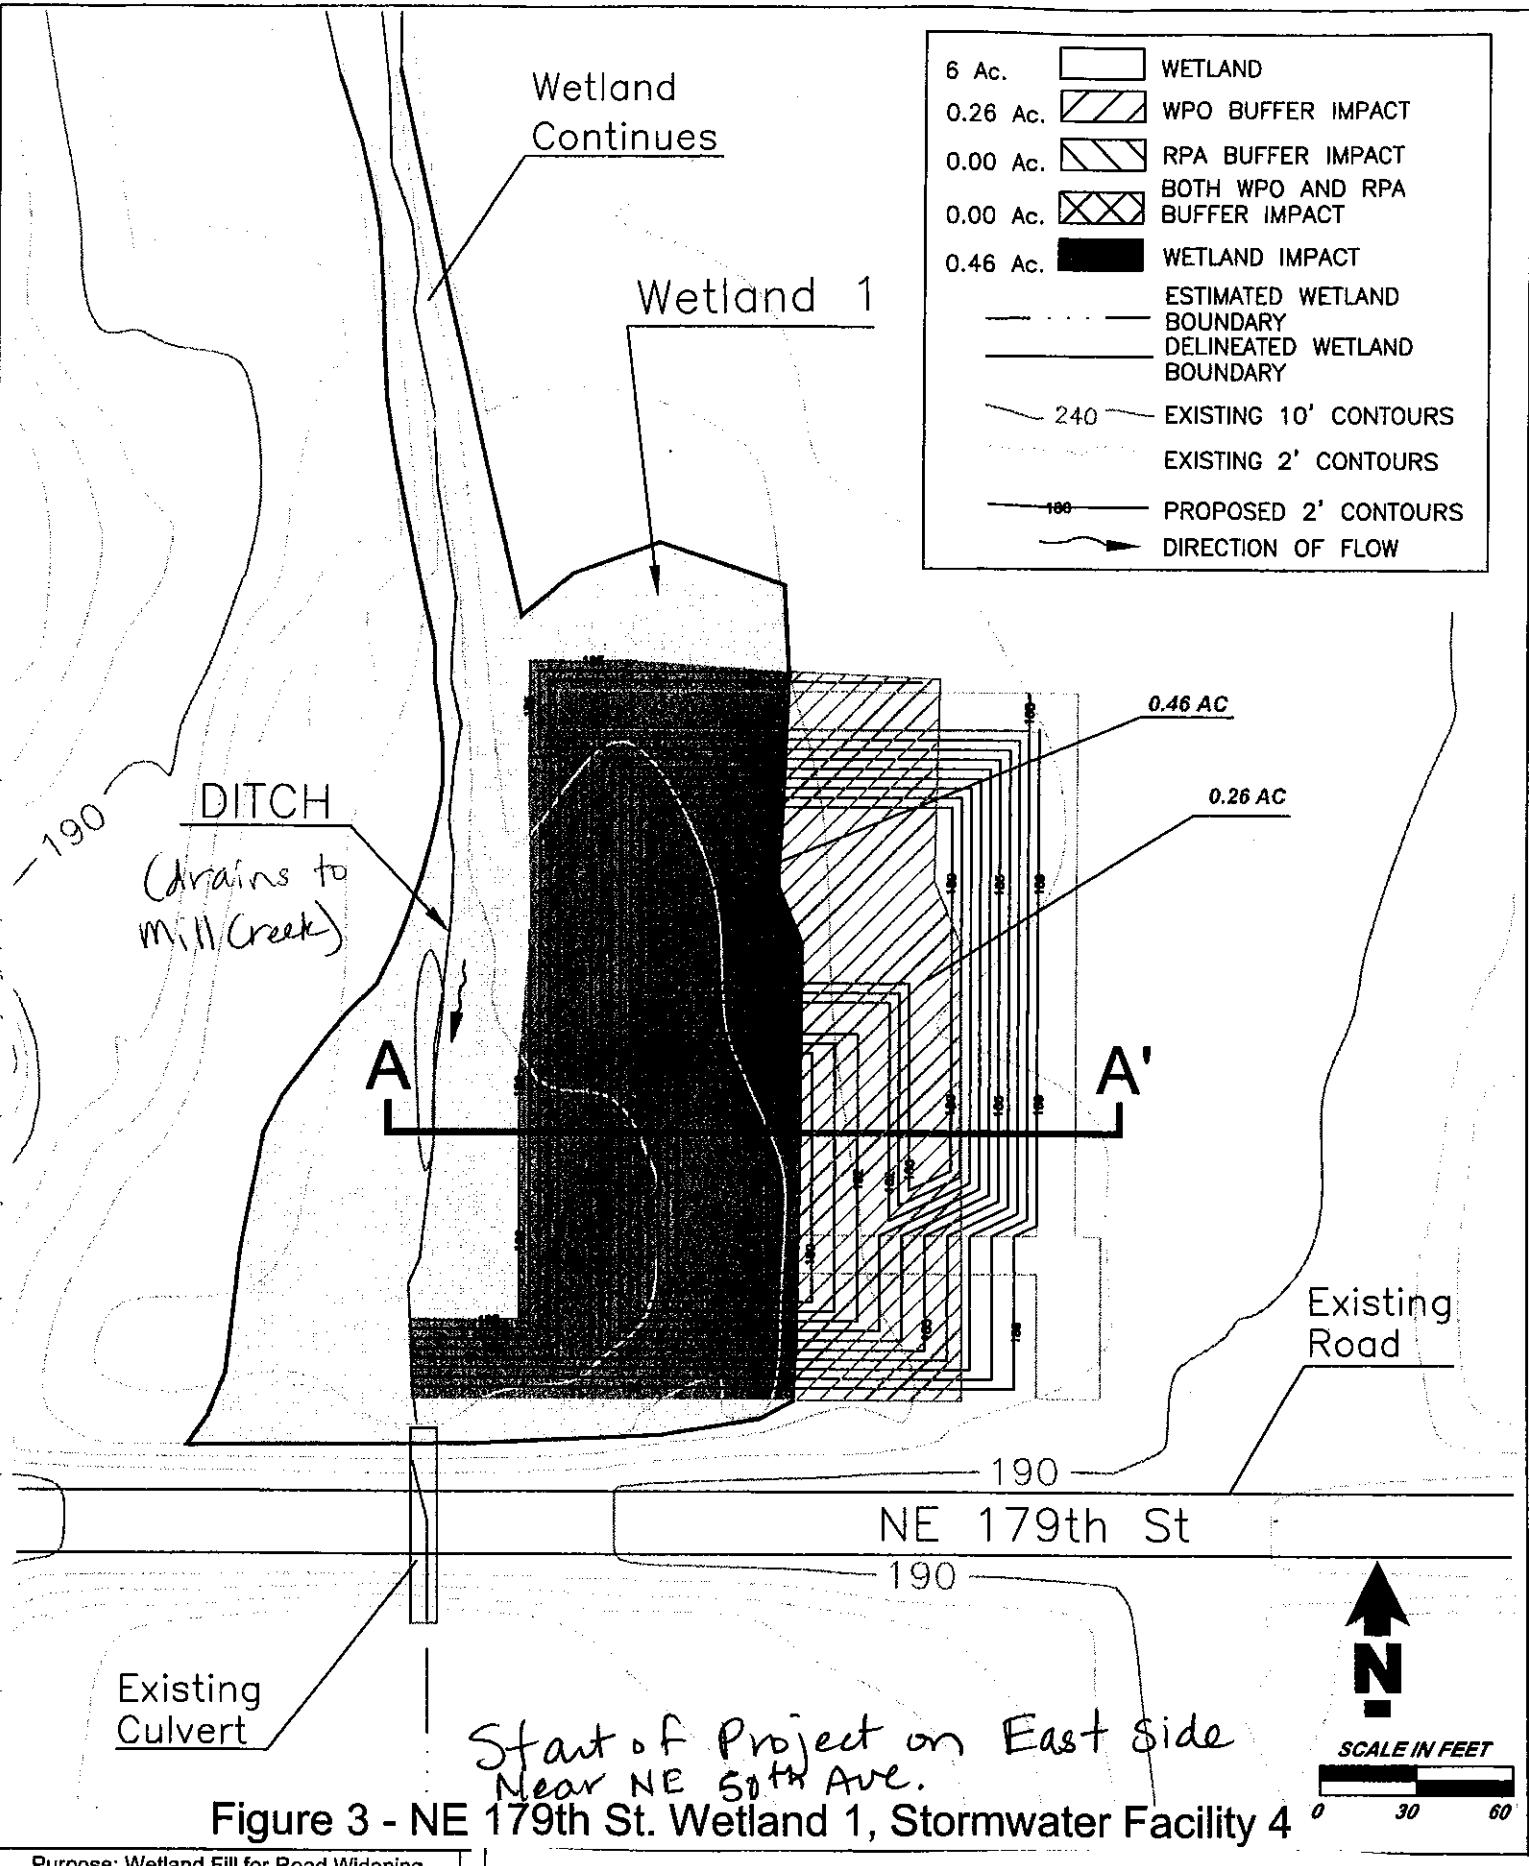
NE 179th St. Wetland 1, Stormwater Facility 4
